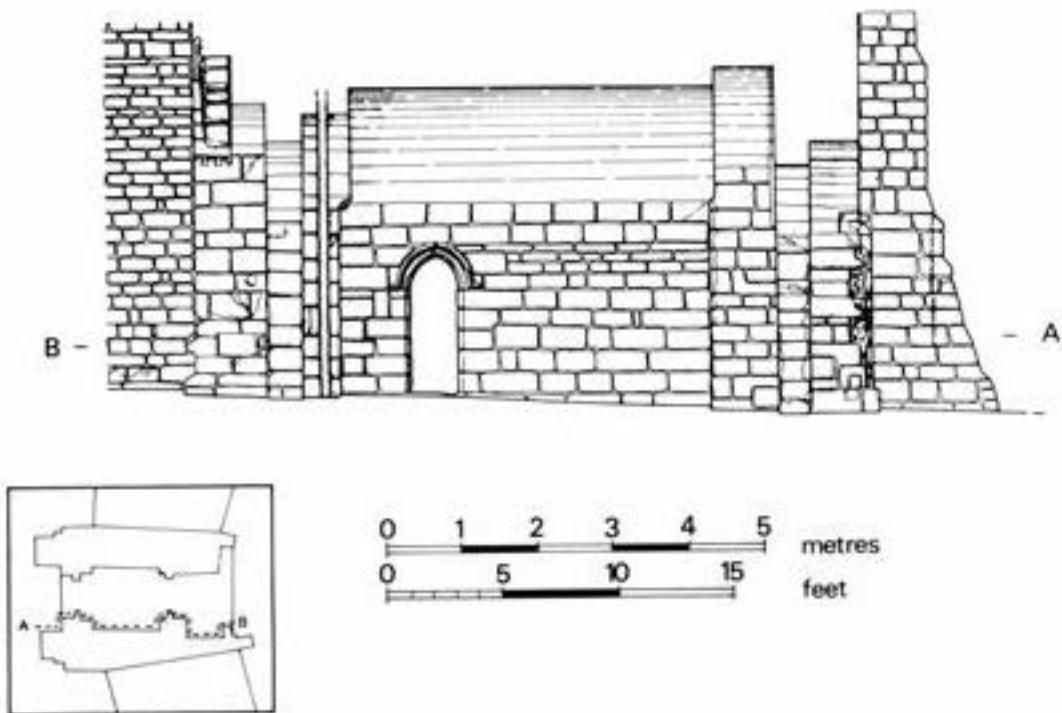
East-west elevation of the south wall of the gate passage showing the door to the guard room of the inner gatehouse
